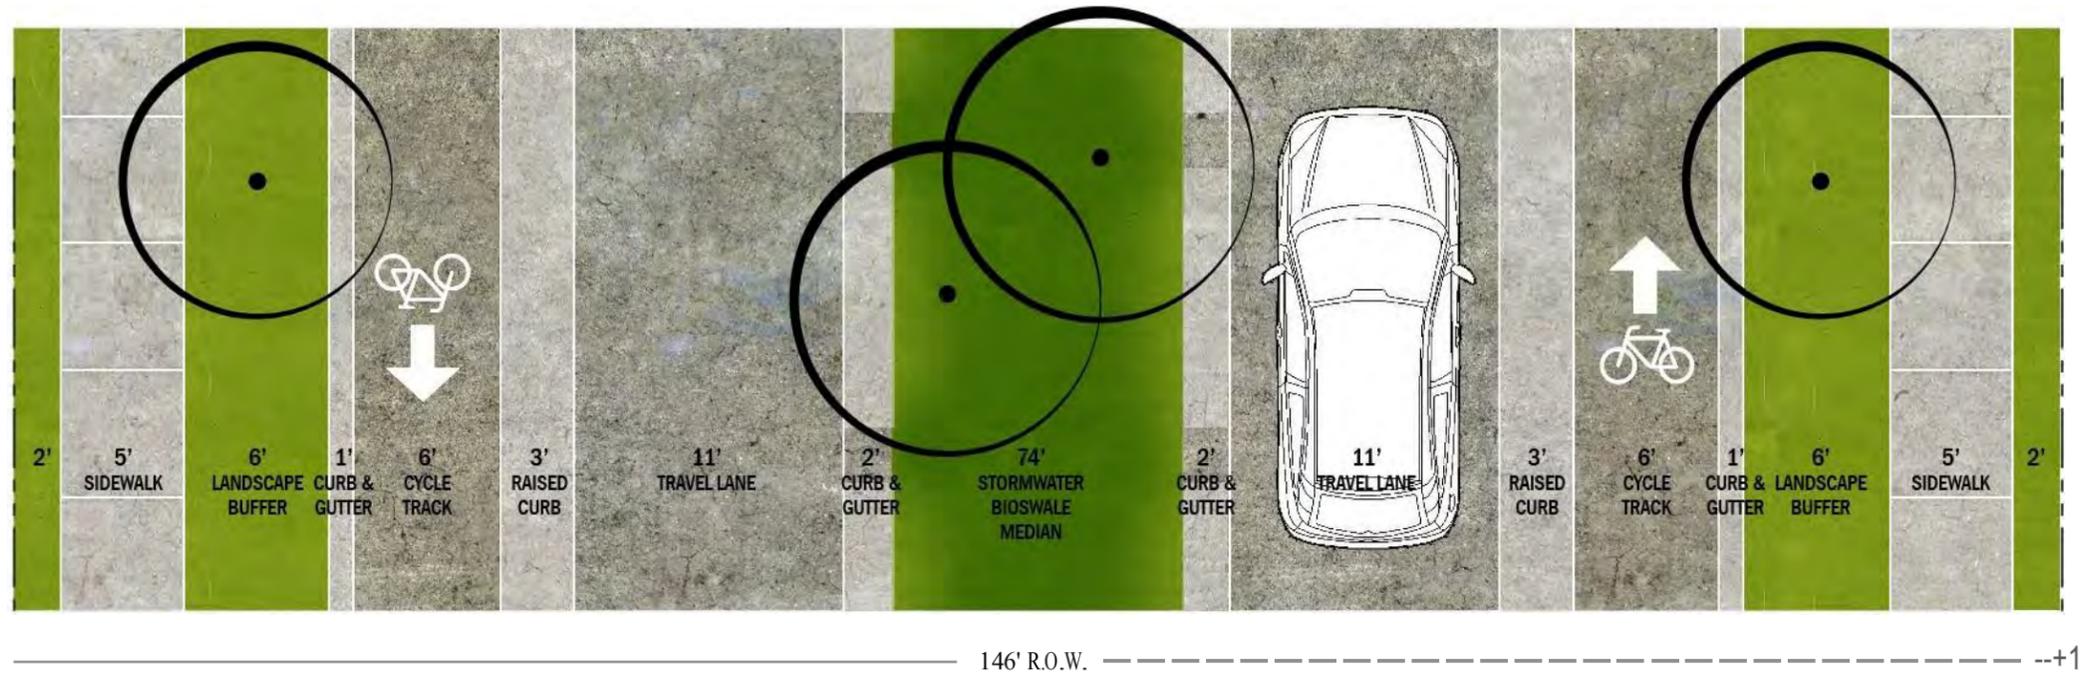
Typical Two- and Four-Lane Arterial Plans
